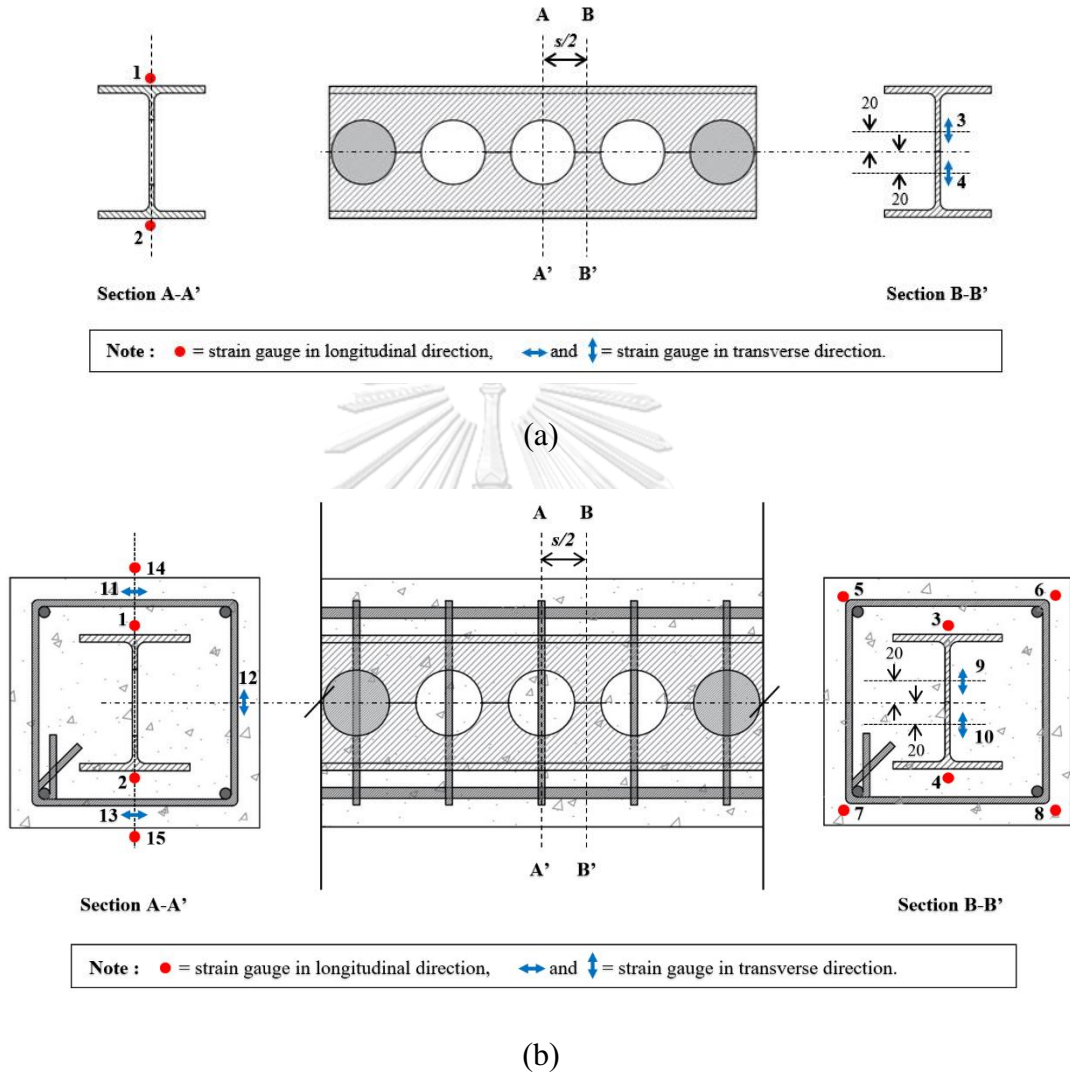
Location of strain gauges (a) cellular steel column; and (b) CECS composite column subjected to eccentric loadings (dimensions in mm).
